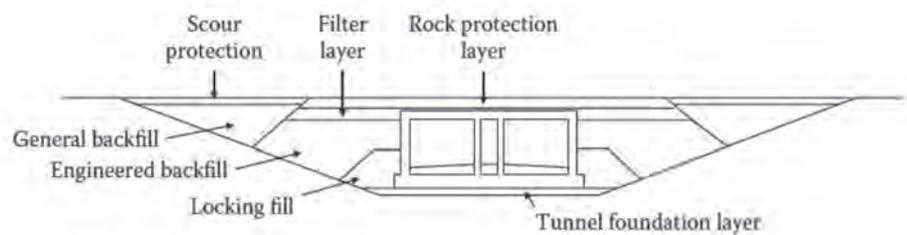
Typical arrangement for backfill (ref : Immersed Tunnels, Lunniss/Baber 2013).
